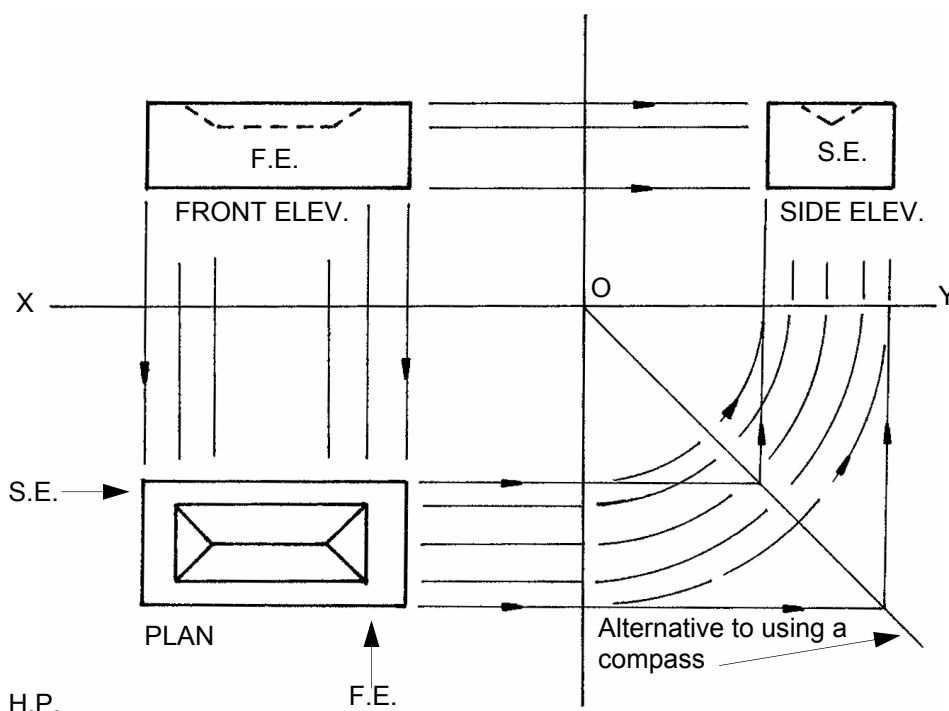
1st angle projection sheet layout and projection lines (dry pressed brick)
